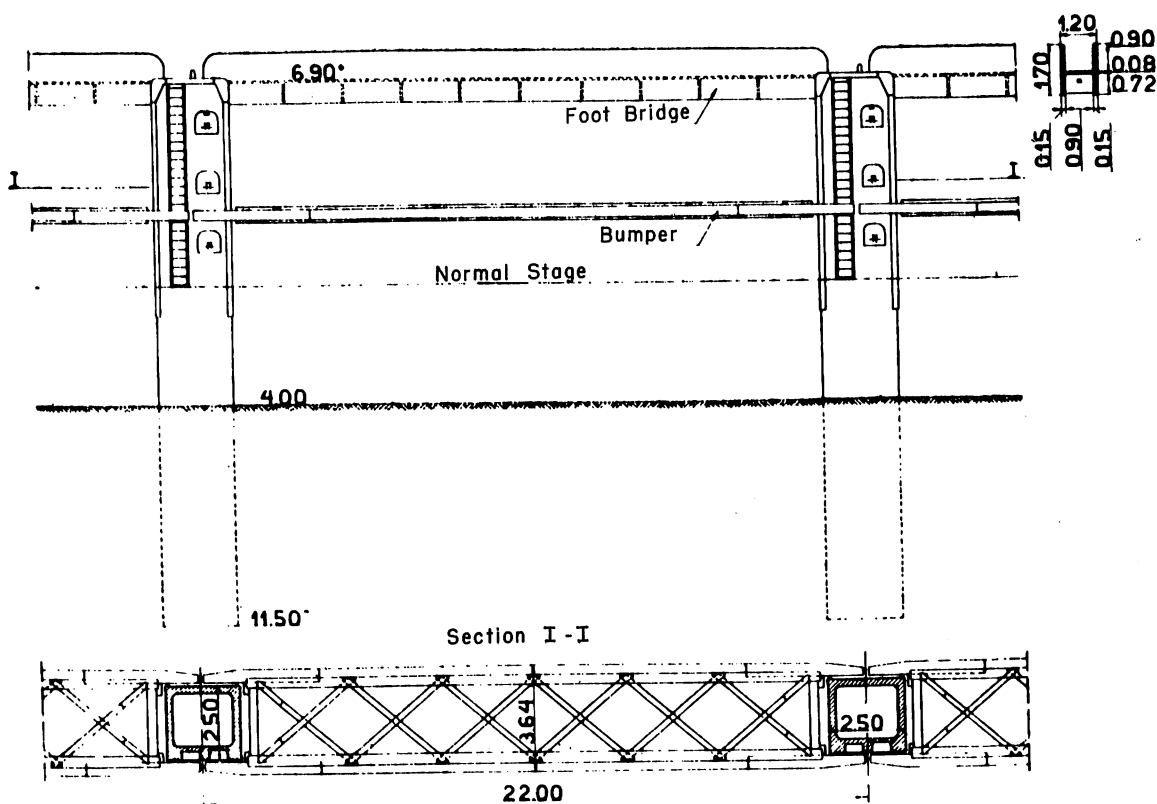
Layout of Mooring Posts with Bridges and Bumpers
